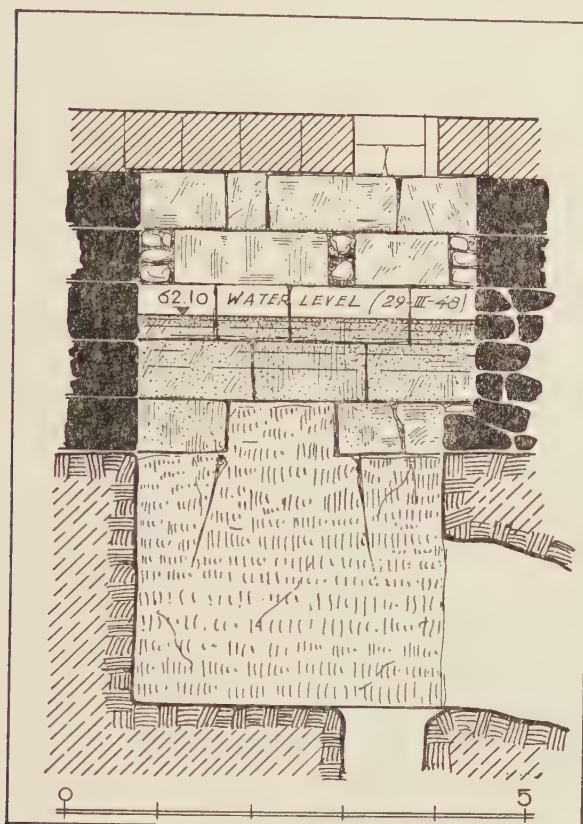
Shaft under House M: Section and Elevation of East Wall, Showing Cave at South and Mouth of Well.
